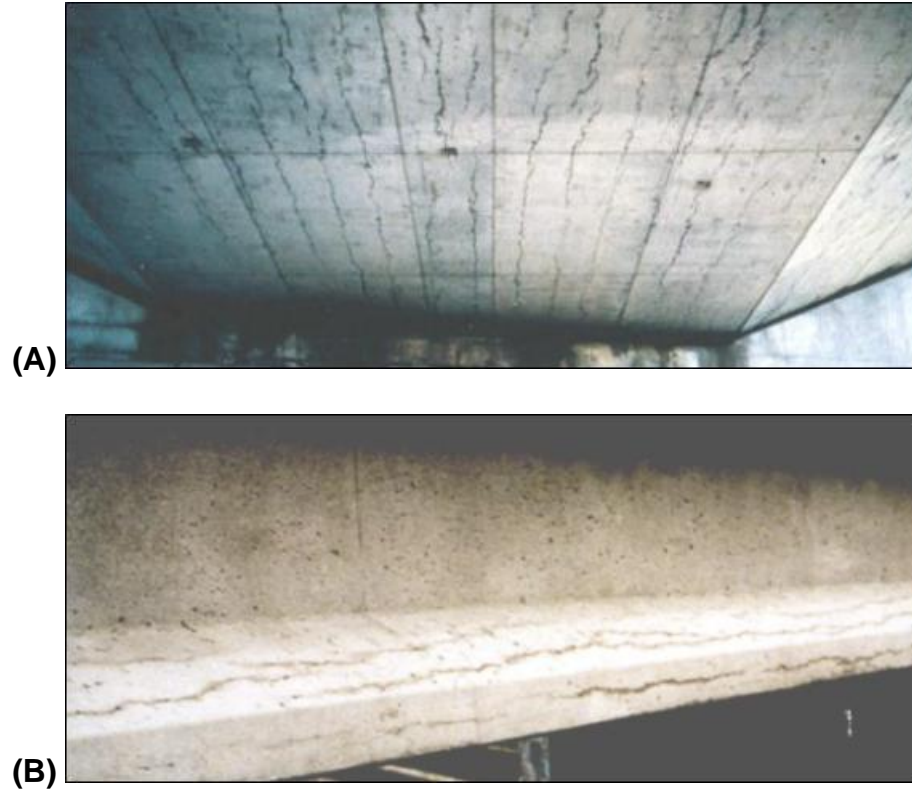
Longitudinal cracking due to ASR in (A) a bridge deck soffit and (B) a precast, reinforced concrete beam (Fournier et al. 2010)
